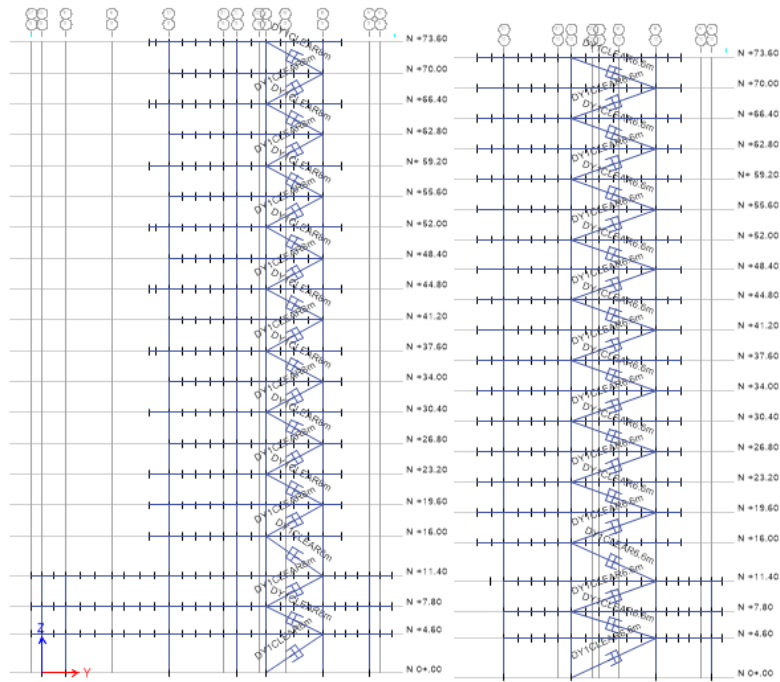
Elevation view 8 and 10 axes of dampers in X direction study case.
